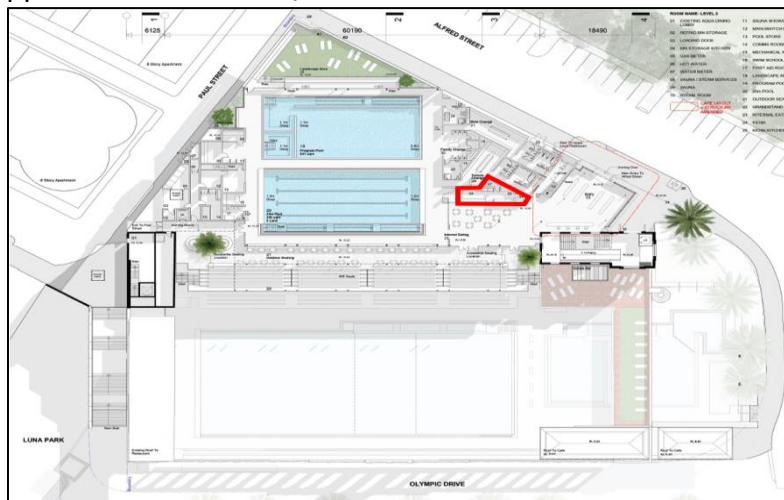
Extract of DA347/2019 endorsed Level 3 Plan showing location of approved kiosk outlined red (Source: Brewster Hjorth Architects, 2020)
